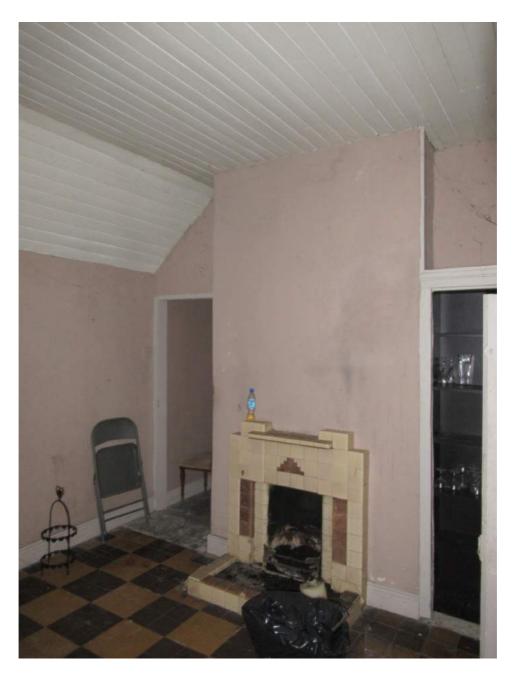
General internal view showing the fireplace in the west room in the cottage.
